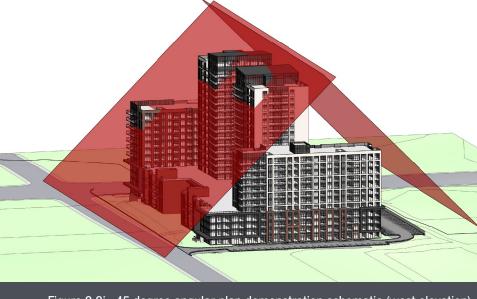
45 degree angular plan demonstration schematic (west elevation)
